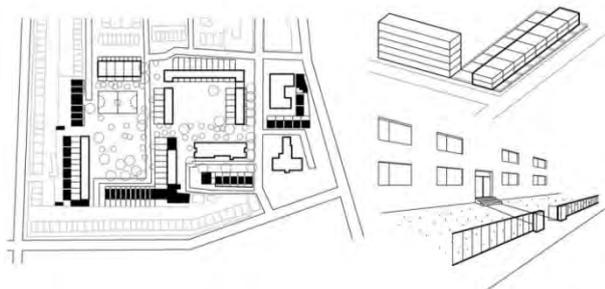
Densification in Dover Court, London. Addition of new buildings helps to create smaller urban units, simple transformation of public space into semi-private one brings principles of defensible space into the area. (Source: Author)
